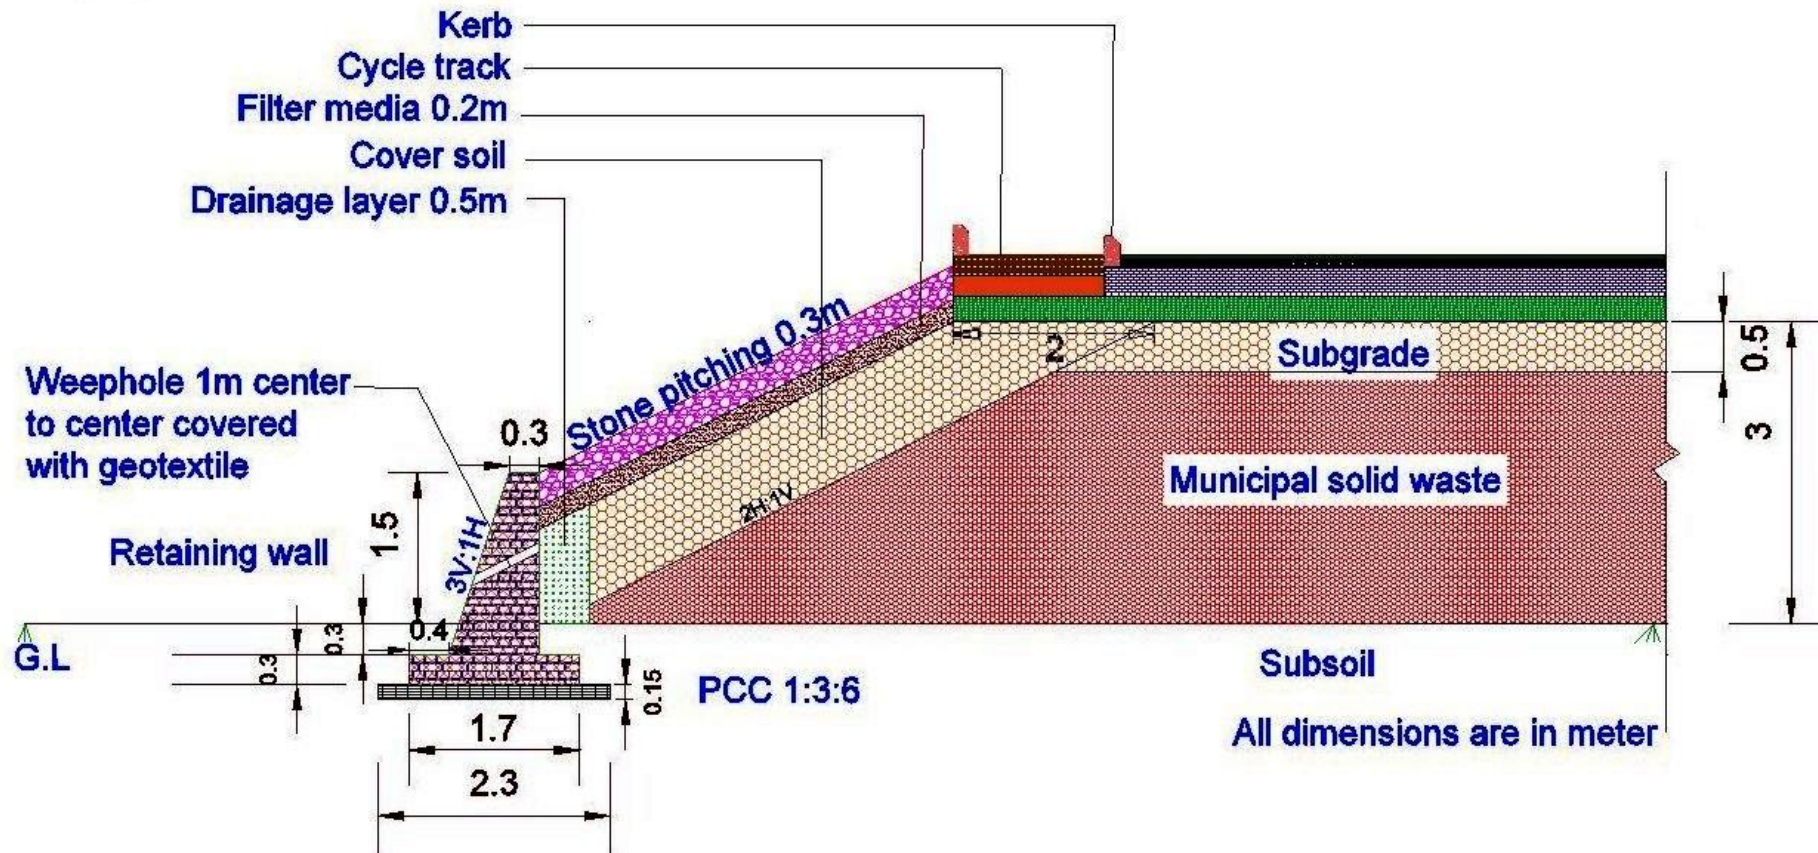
Cross –section for construction of 3m Height MSW embankment (River side)
